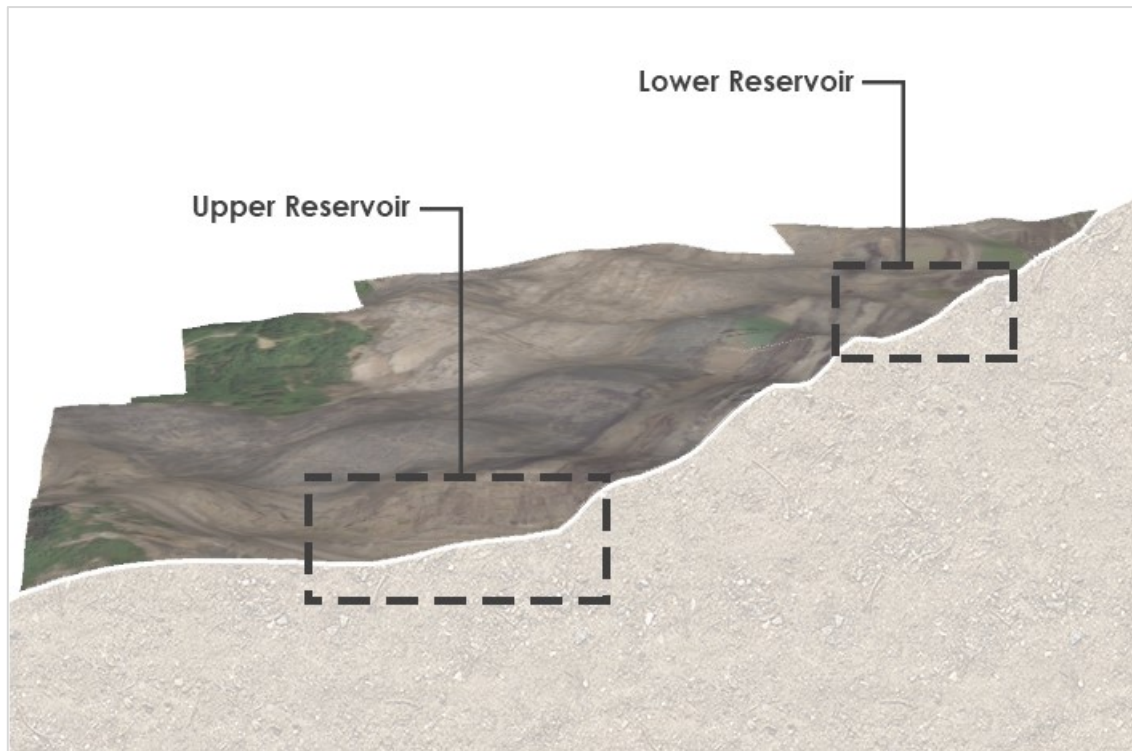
Cross-section view of a pumped hydro storage site at ex-coal mining pits
